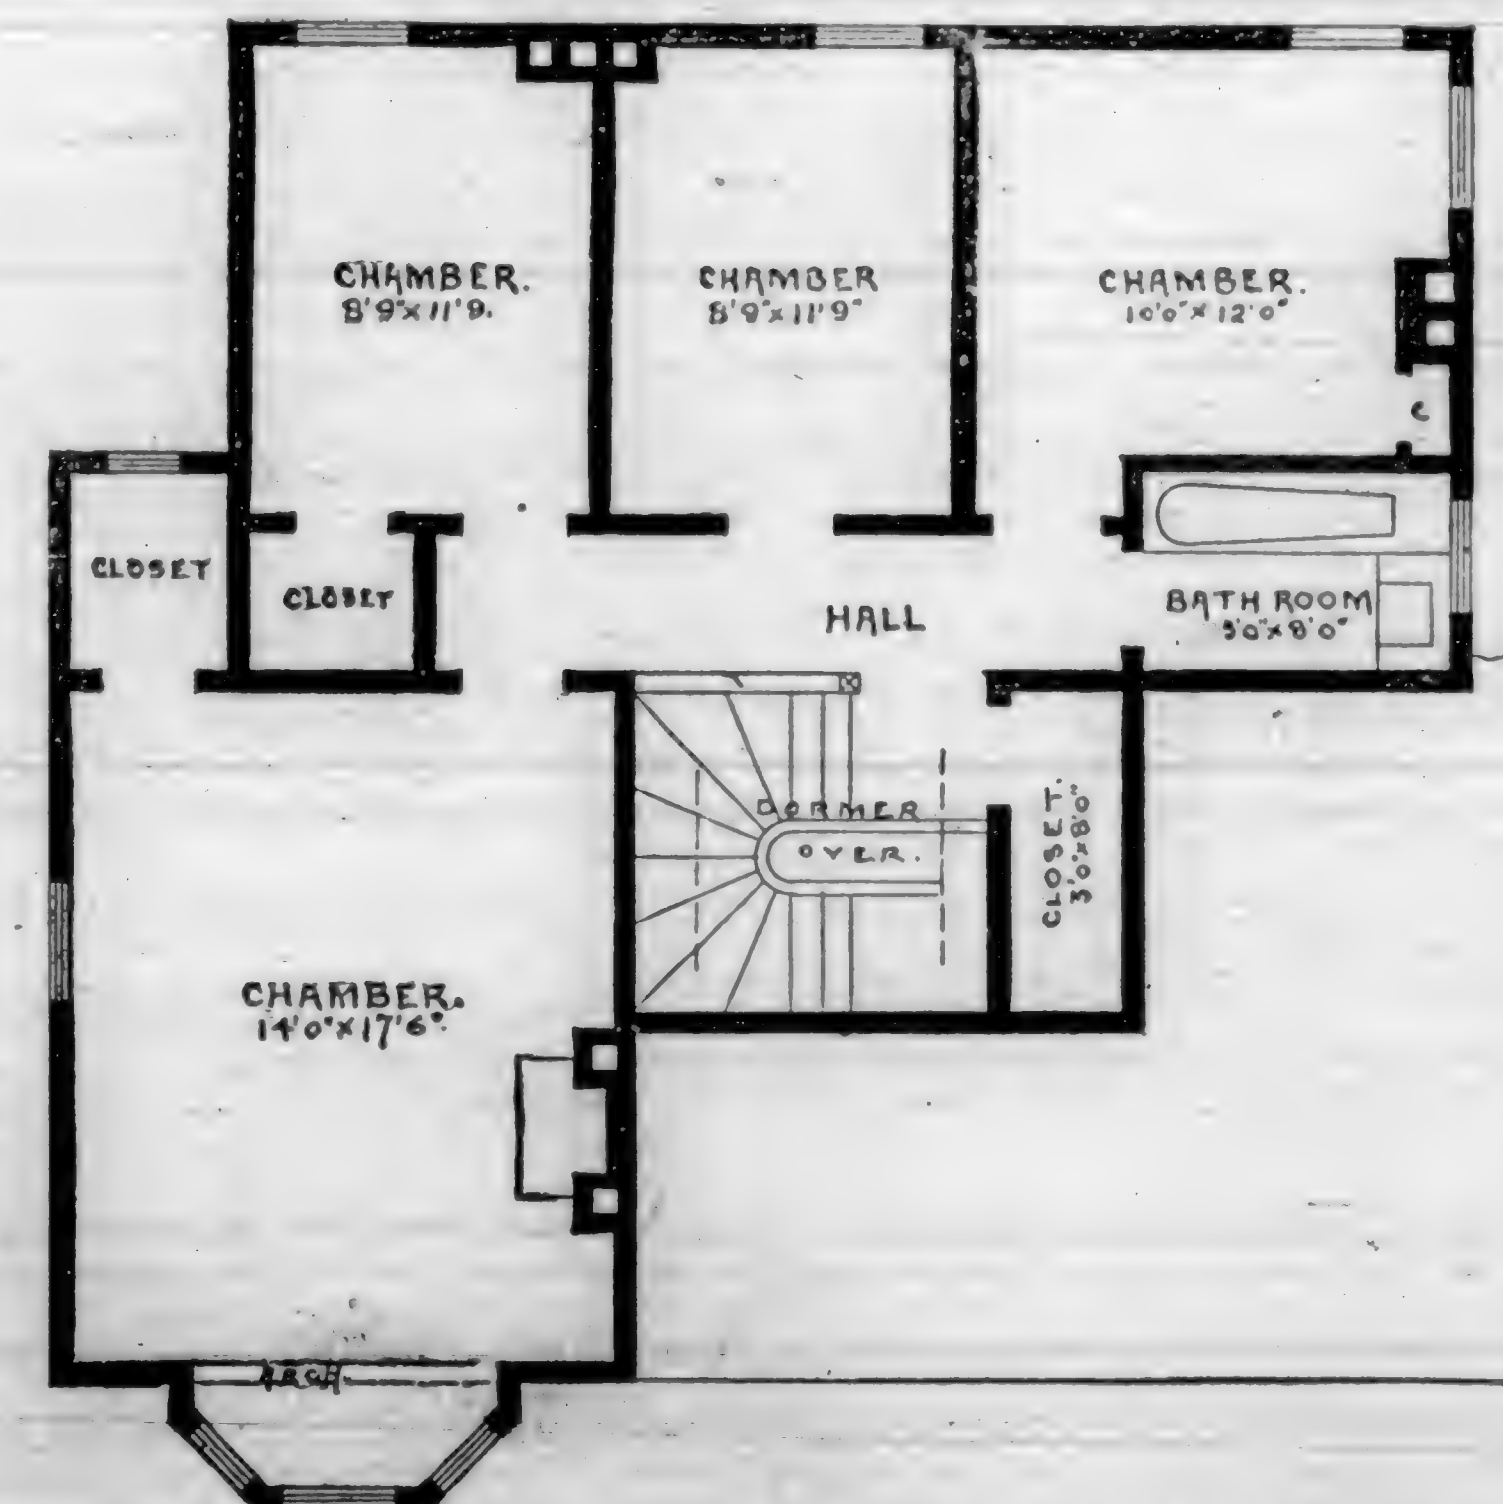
SECOND FLOOR PLAN OF SUBURBAN DWELLING.
